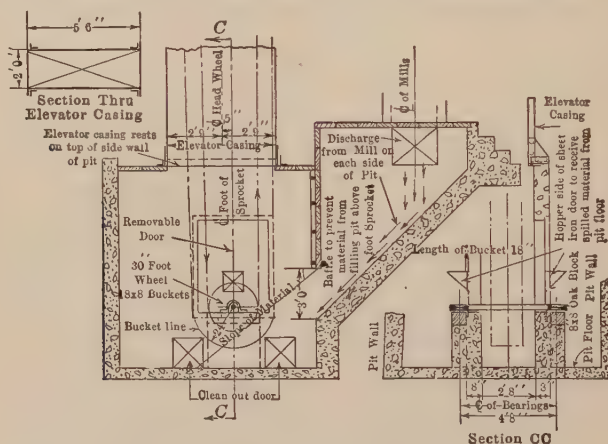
Concrete Pit and Boot for Pulverized Stone Elevator.
